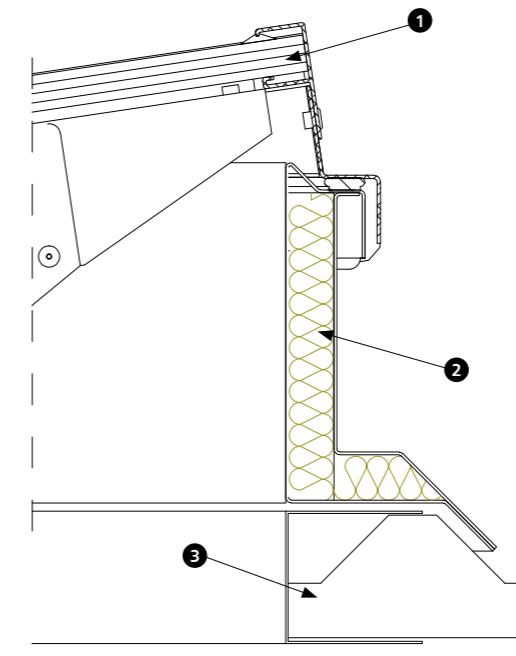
Installation of louvered vent on a sheet-covered system roof
